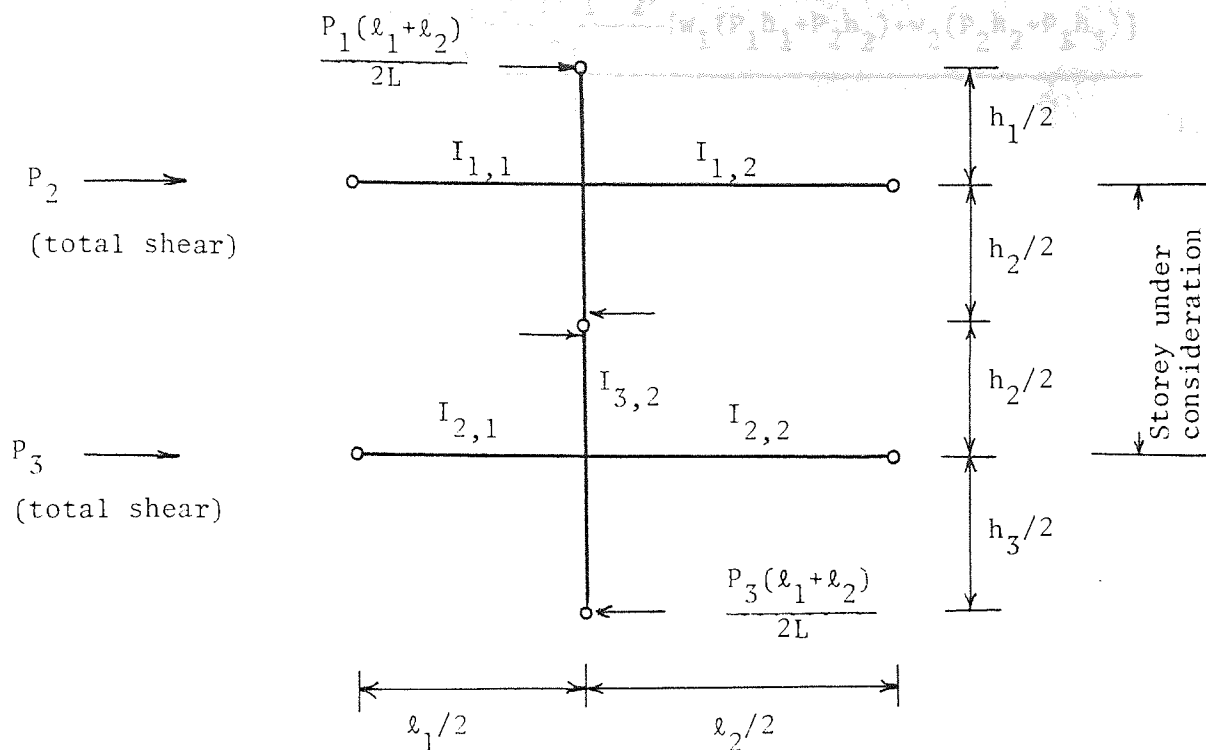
A TYPICAL SUBASSEMBLAG IN ANDERSON AND ISLAM'S DESIGN SHOWS THE SECOND COLUMN FROM THE WINDWARD FACE OF A TYPICAL INTERMEDIATE STOREY
